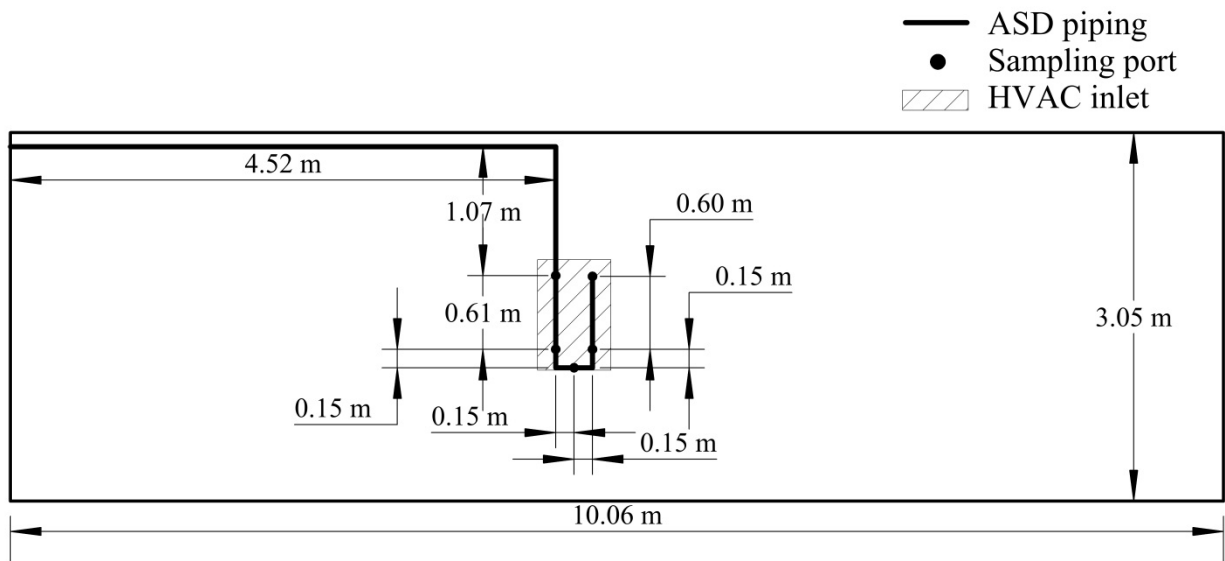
ASD4 piping layout, with sampling location located at the HVAC exhaust
